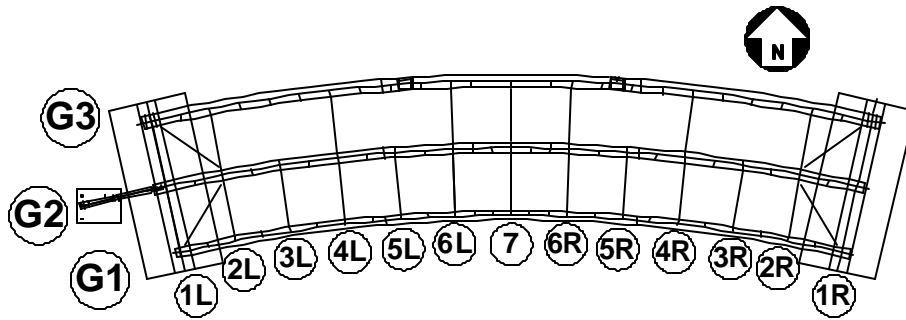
Bridge plan (courtesy FHWA/HDR, Inc.).
